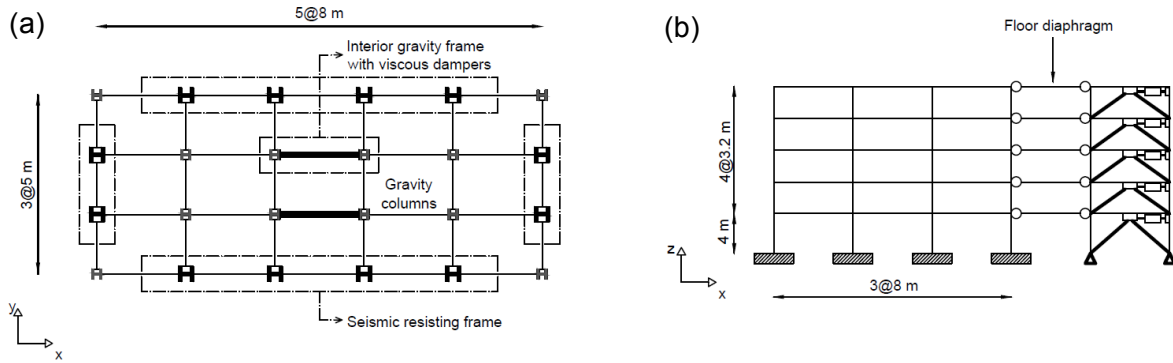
(a) Plan view of the prototype building; (b) Elevation view of the prototype building
